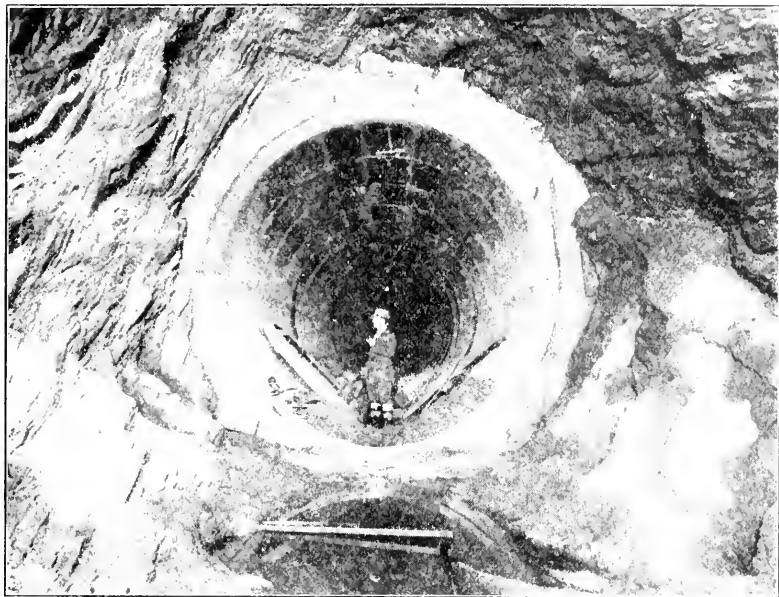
COMPLETED PRESSURE TUNNEL IN NEW YORK CITY.
